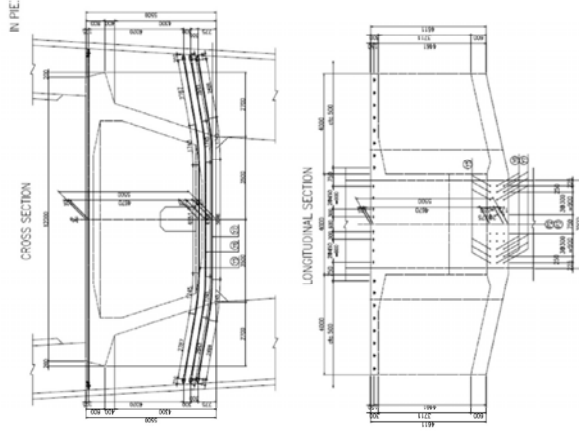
Cross-section wise Cable Arrangement of the Cross Beam (above P2)
